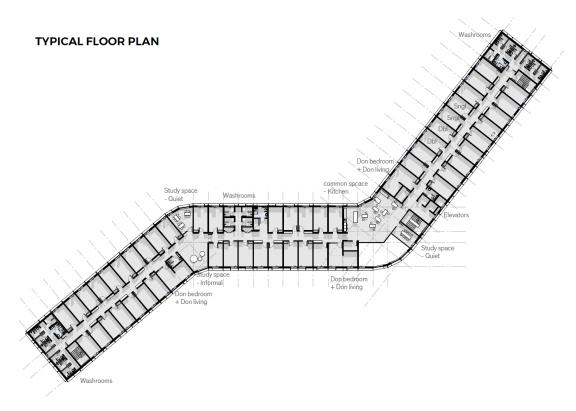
Typical Residence Floor Layout (Christensen & Co/ Montgomery Sisam)
